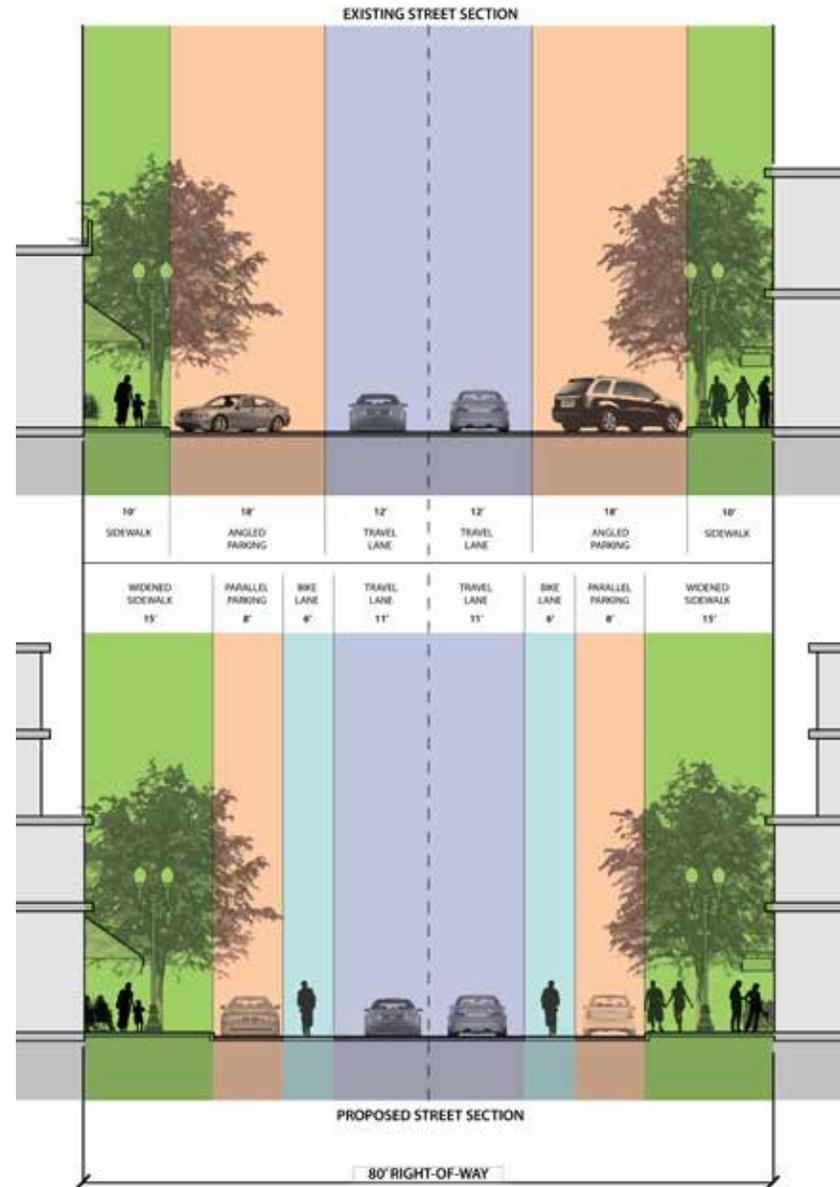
Grand Avenue with Parallel Parking and Widened Sidewalks
